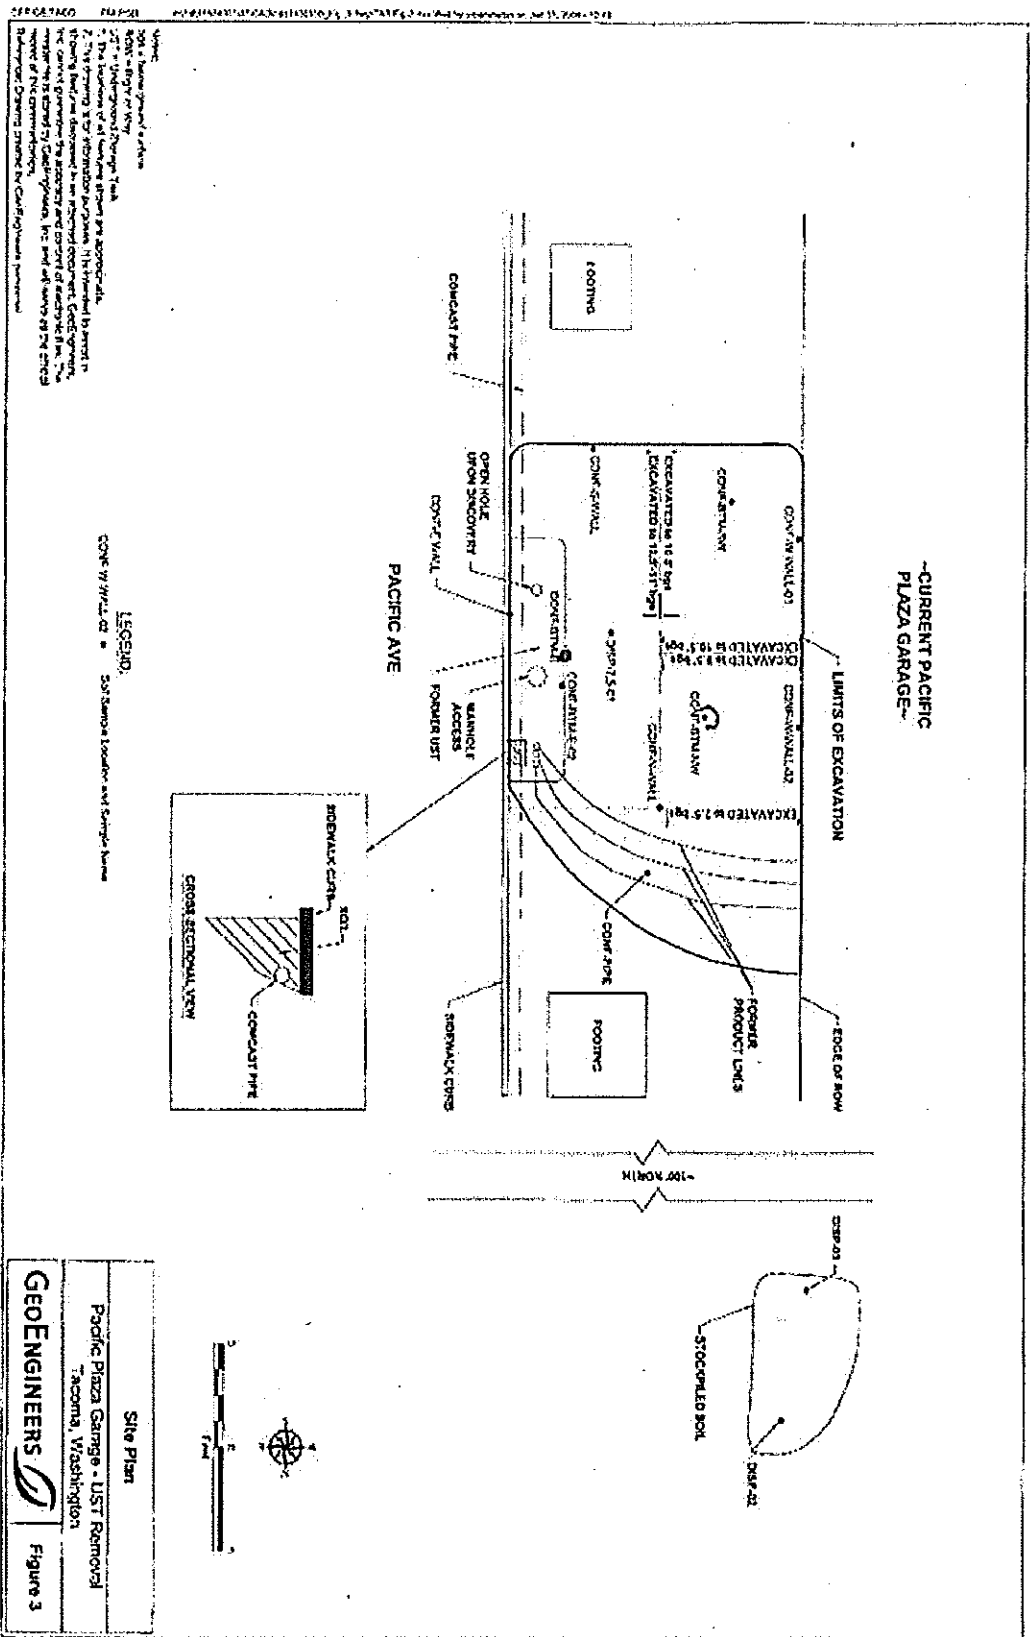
UST Removal, Soil Excavation, and Confirmation Sampling (soil & groundwater) Locations at the Pacific Plaza Site
